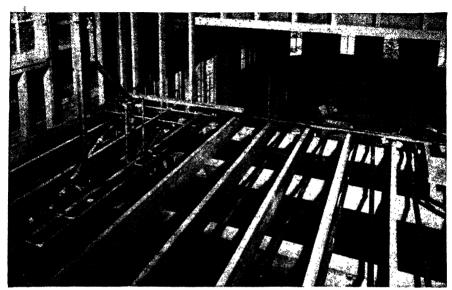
Residential second-story floor construction. (Bethlehem Steel Company.)
